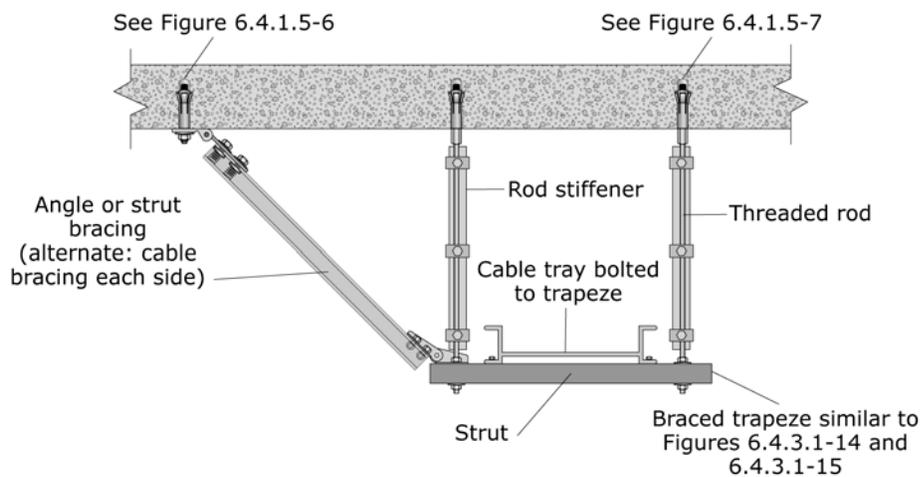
Cable tray on braced trapeze (ER).
